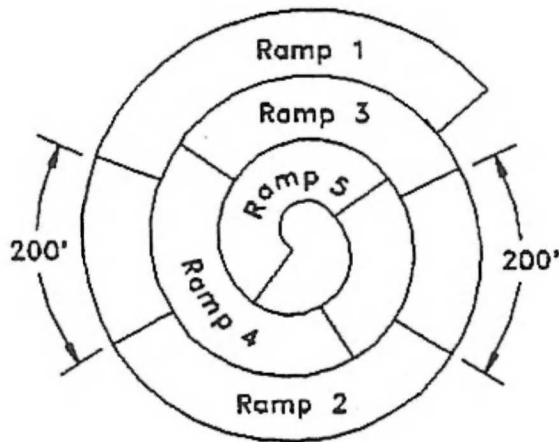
Plan view showing ramp locations for a five bench mine.
